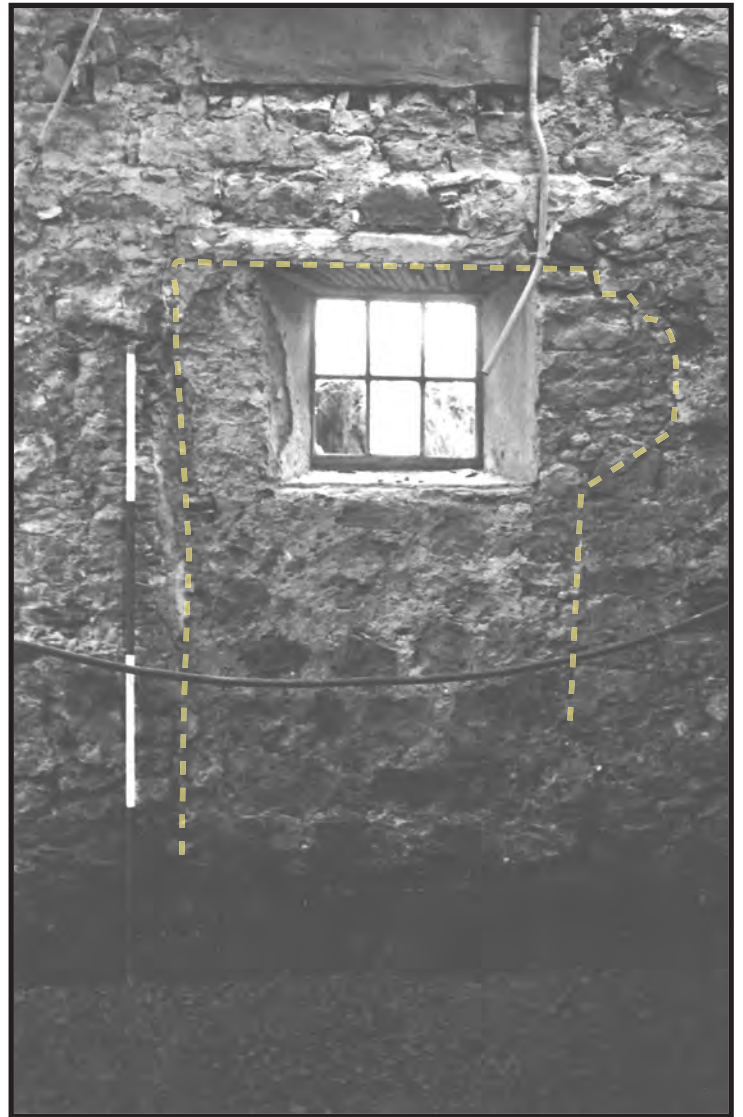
Room A4, detail of blocked window (F47) along the south-east wall
